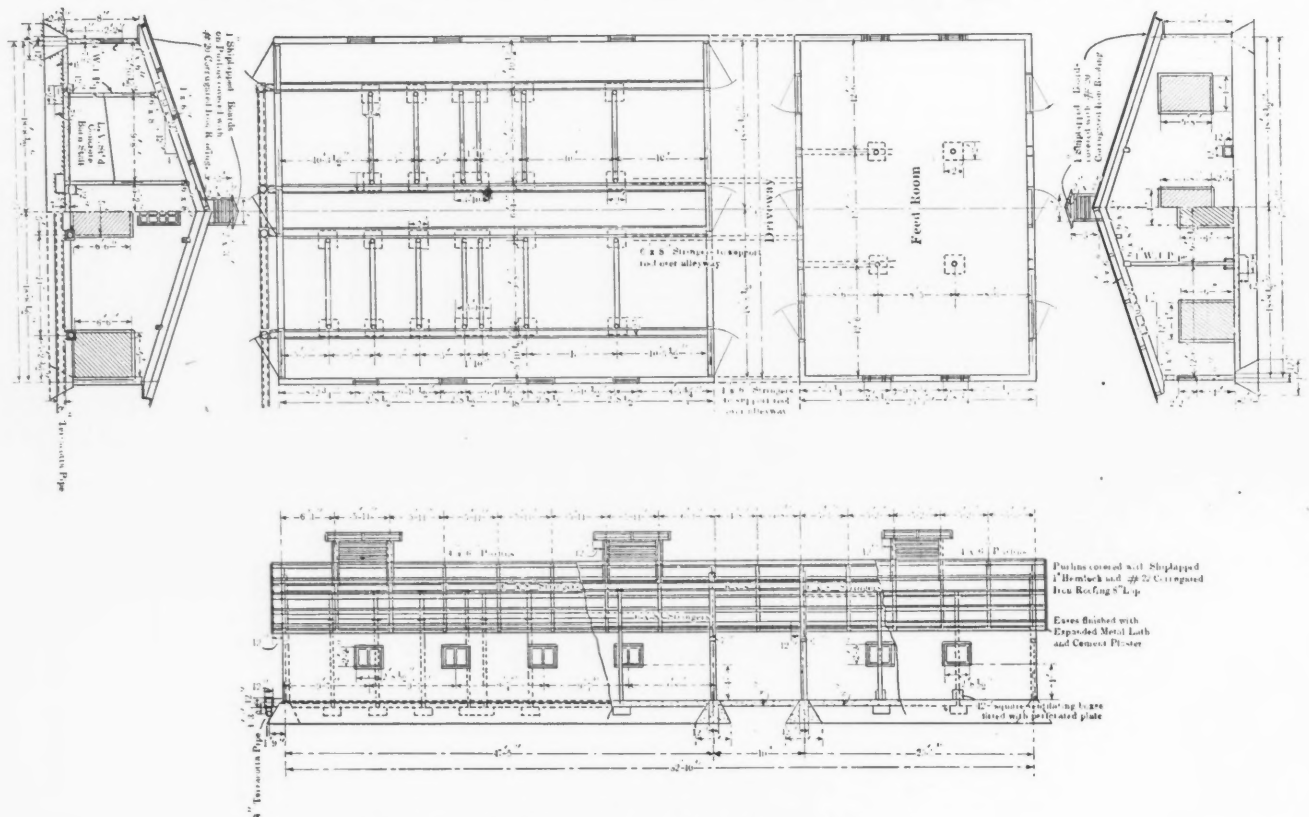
CONCRETE OUTSIDE MULE BARN AND FEED ROOM
